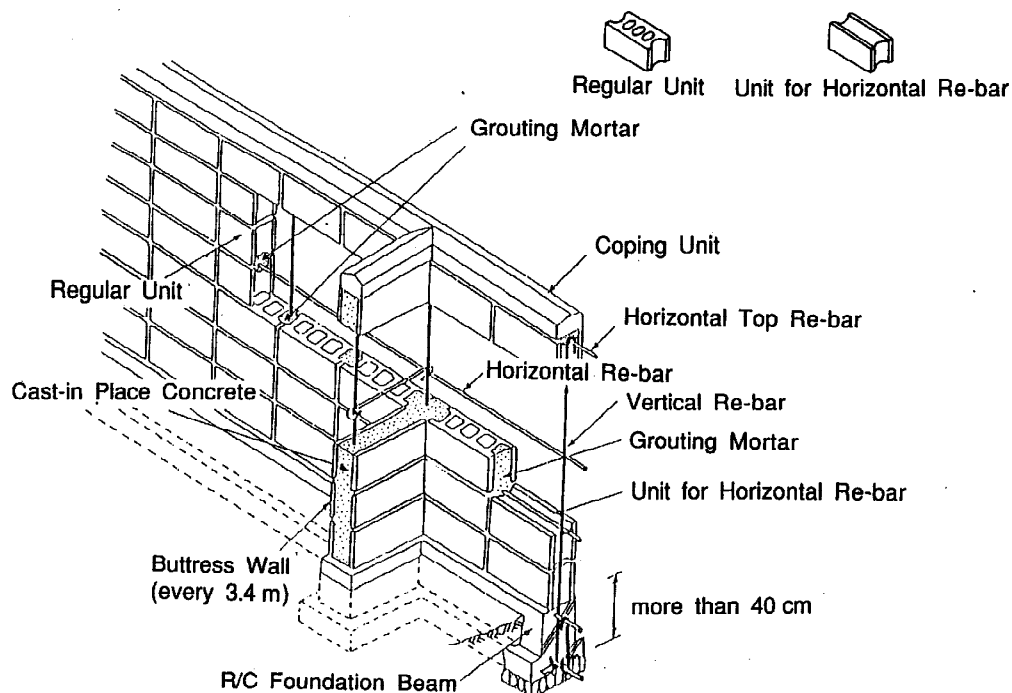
A hollow concrete-block masonry garden wall designed by current Japanese design standards.
